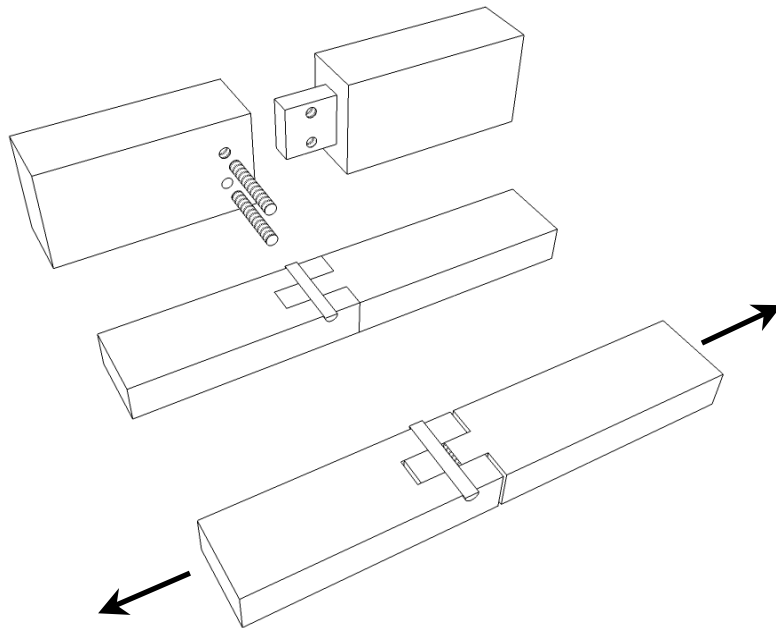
Typical mortise and tenon connection with section cuts through an undeformed and a deformed connection
